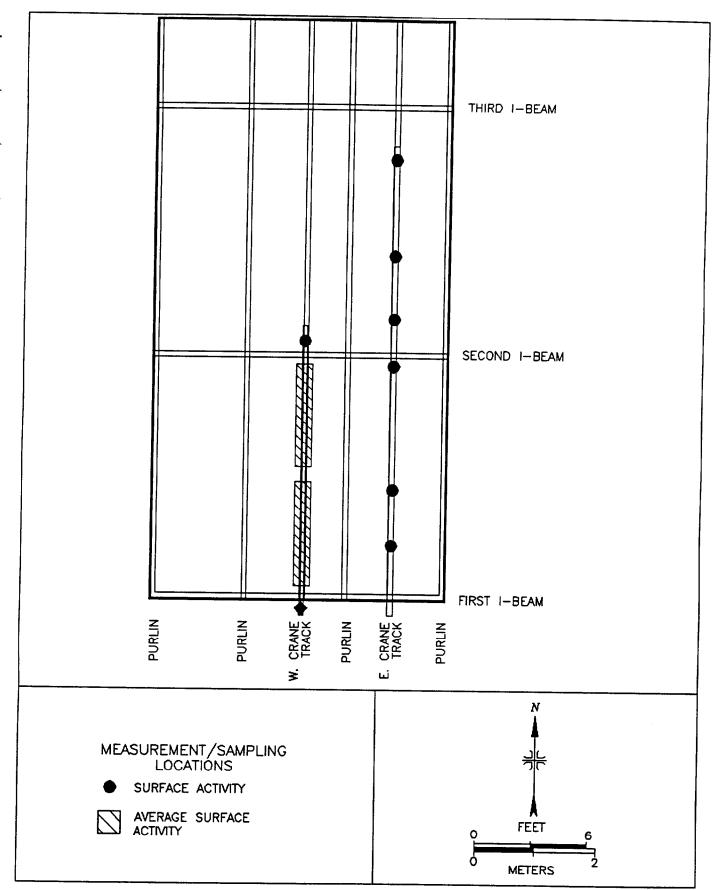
Building 8, Room B, Overheads (Looking Down From Above) — Measurement and Sampling Locations
